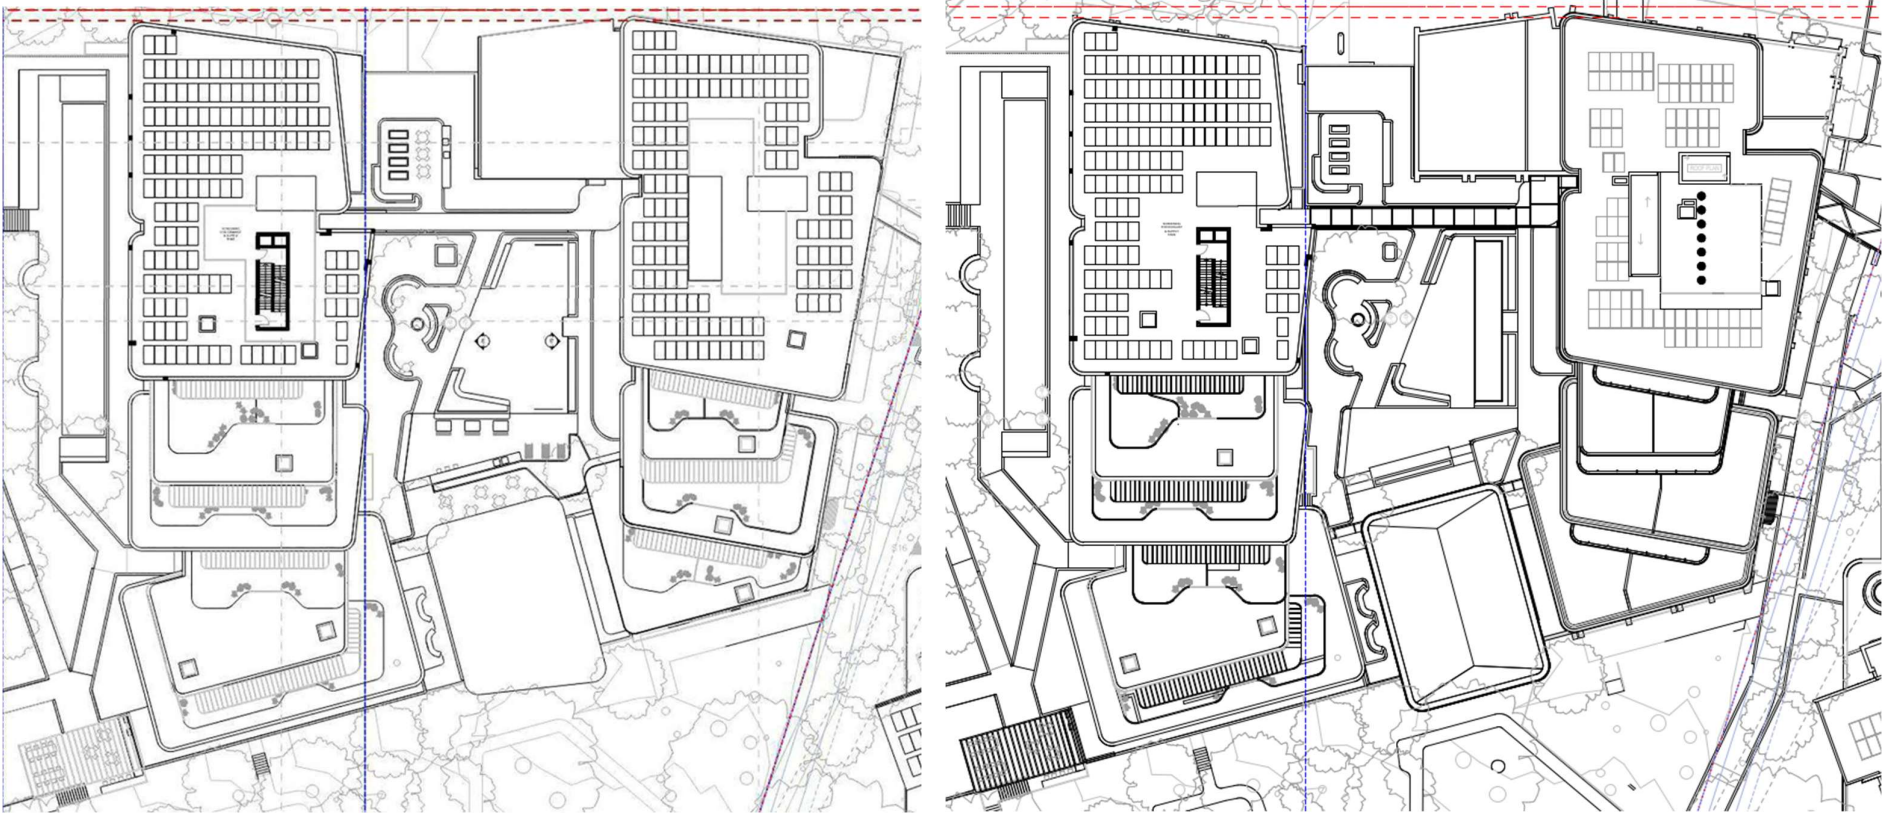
Approved and Proposed Roof Level of Building B and C (2 of 2)
